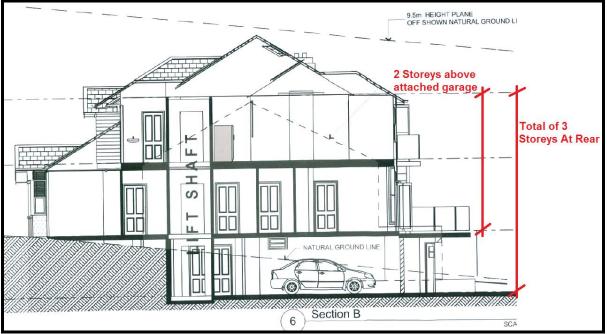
Section demonstrating three (3) storey component of dwelling at the rear with two (2) storeys located above the attached garage.
